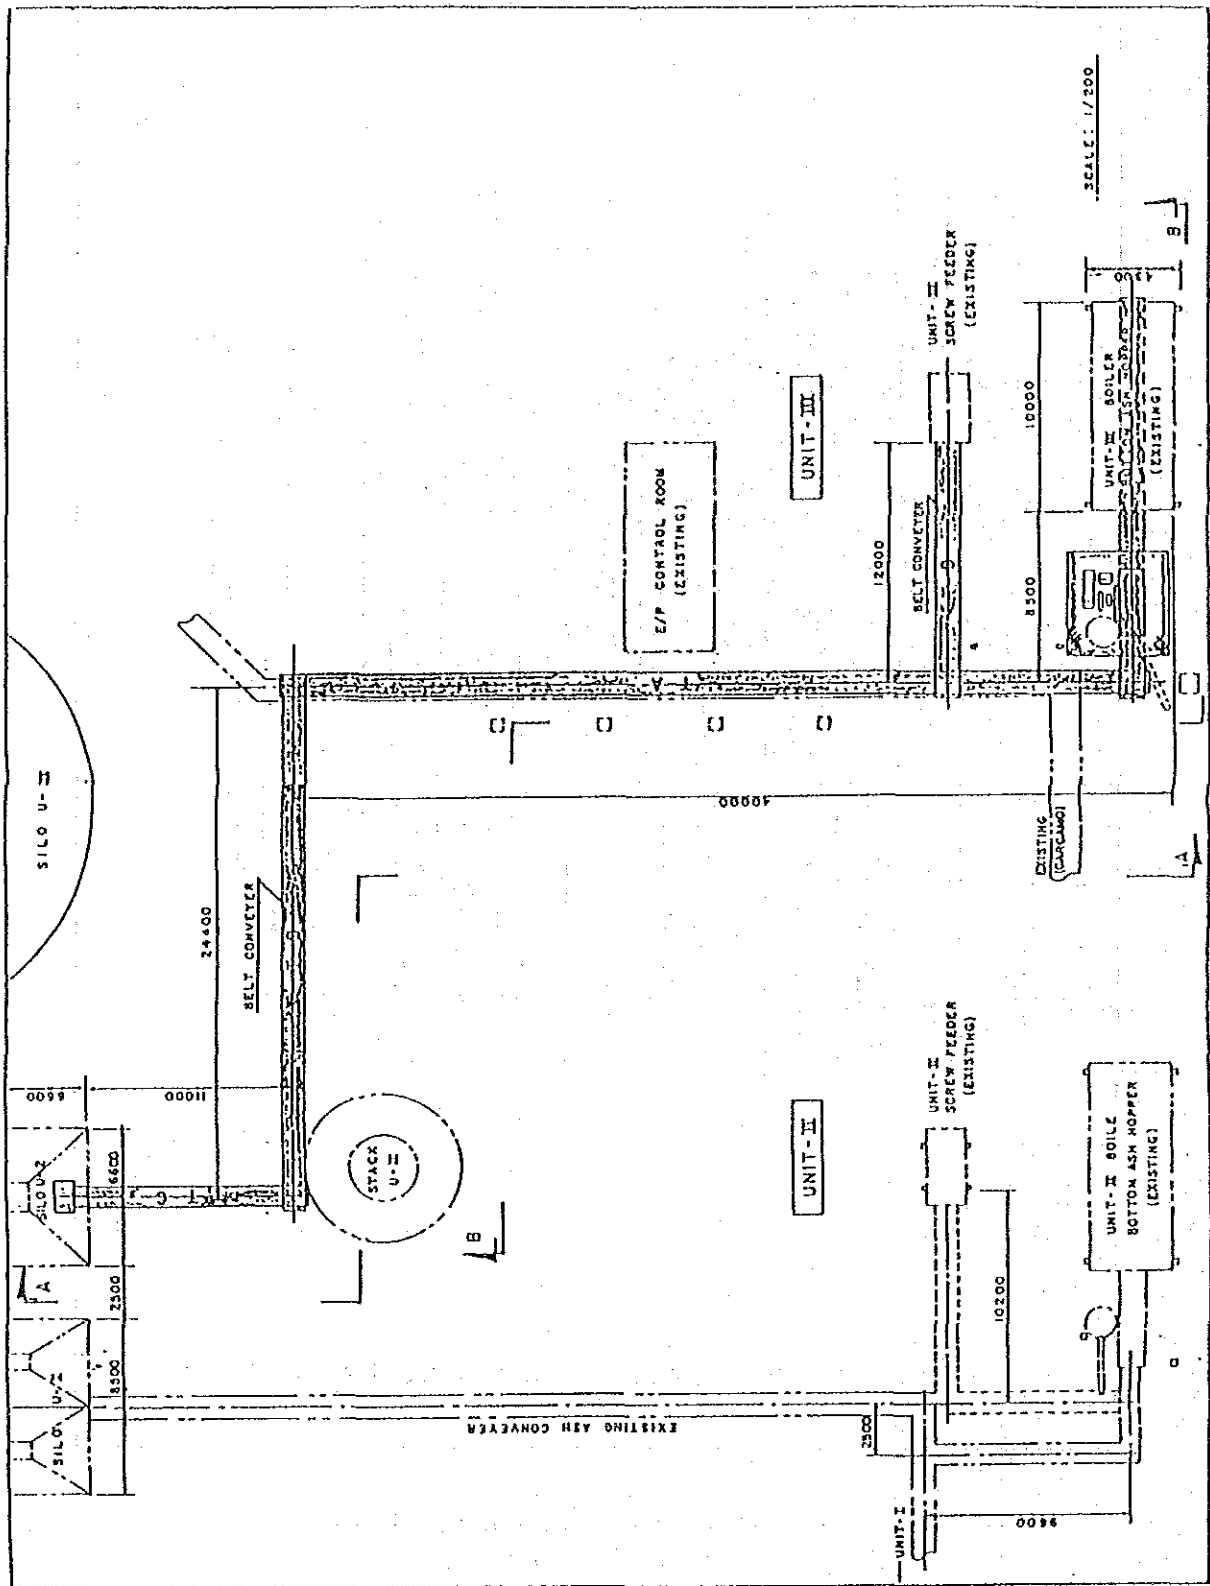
Conveyor Path Layout (Plan view)
